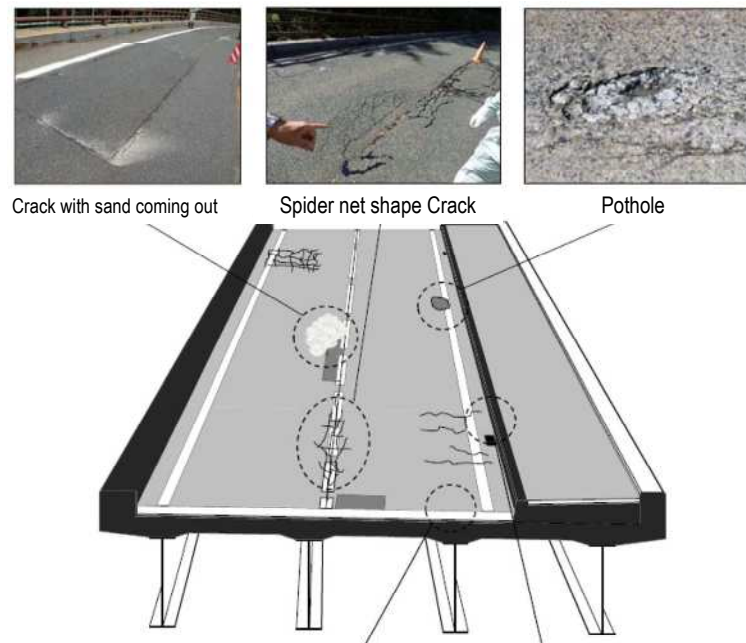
Example of Damages of Wearing Course, Pavement
